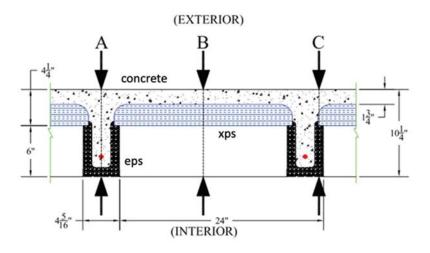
Precast insulated panel, cross-section. The wall panel is shown with the stud sections insulted with approximately 1 in. of expanded polystyrene. The cavity between the stud members is insulated with extruded polystyrene, a thickness of 2 in.
